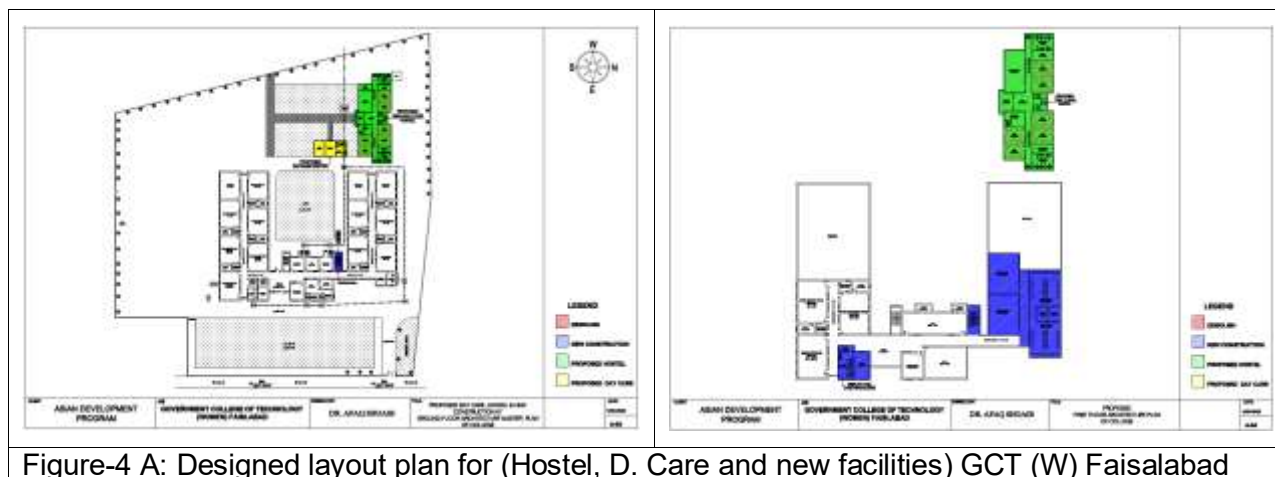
A: Designed layout plan for (Hostel, D. Care and new facilities) GCT (W) Faisalabad
